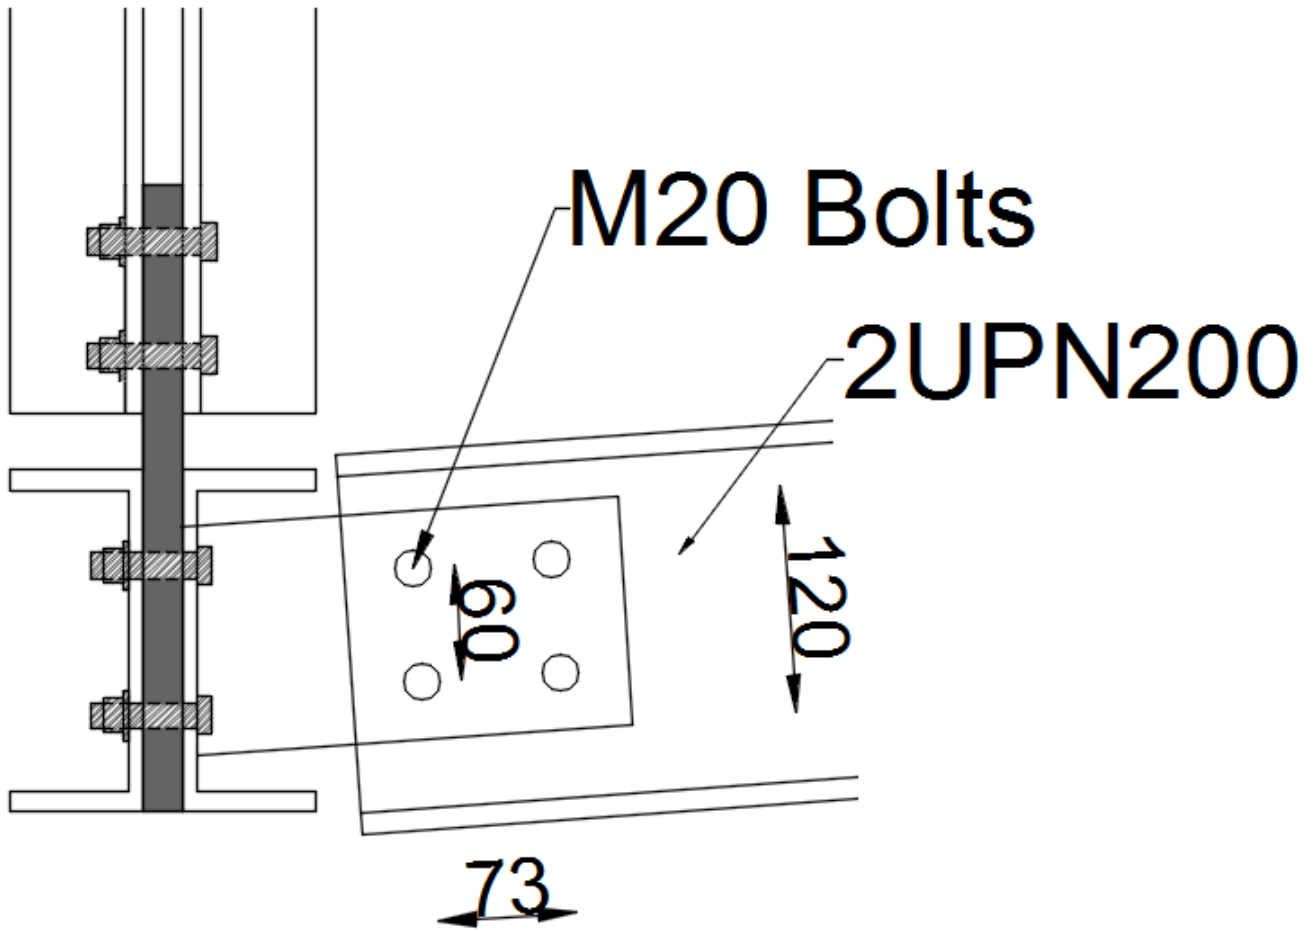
Secondary Truss and Normal Truss Connection Detail (see Figure-38)
